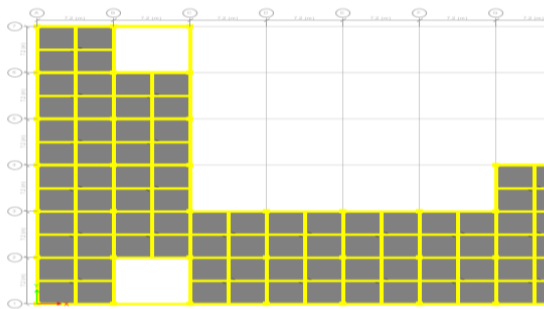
Asymmetric 15 Bedded Hospital Building plan
